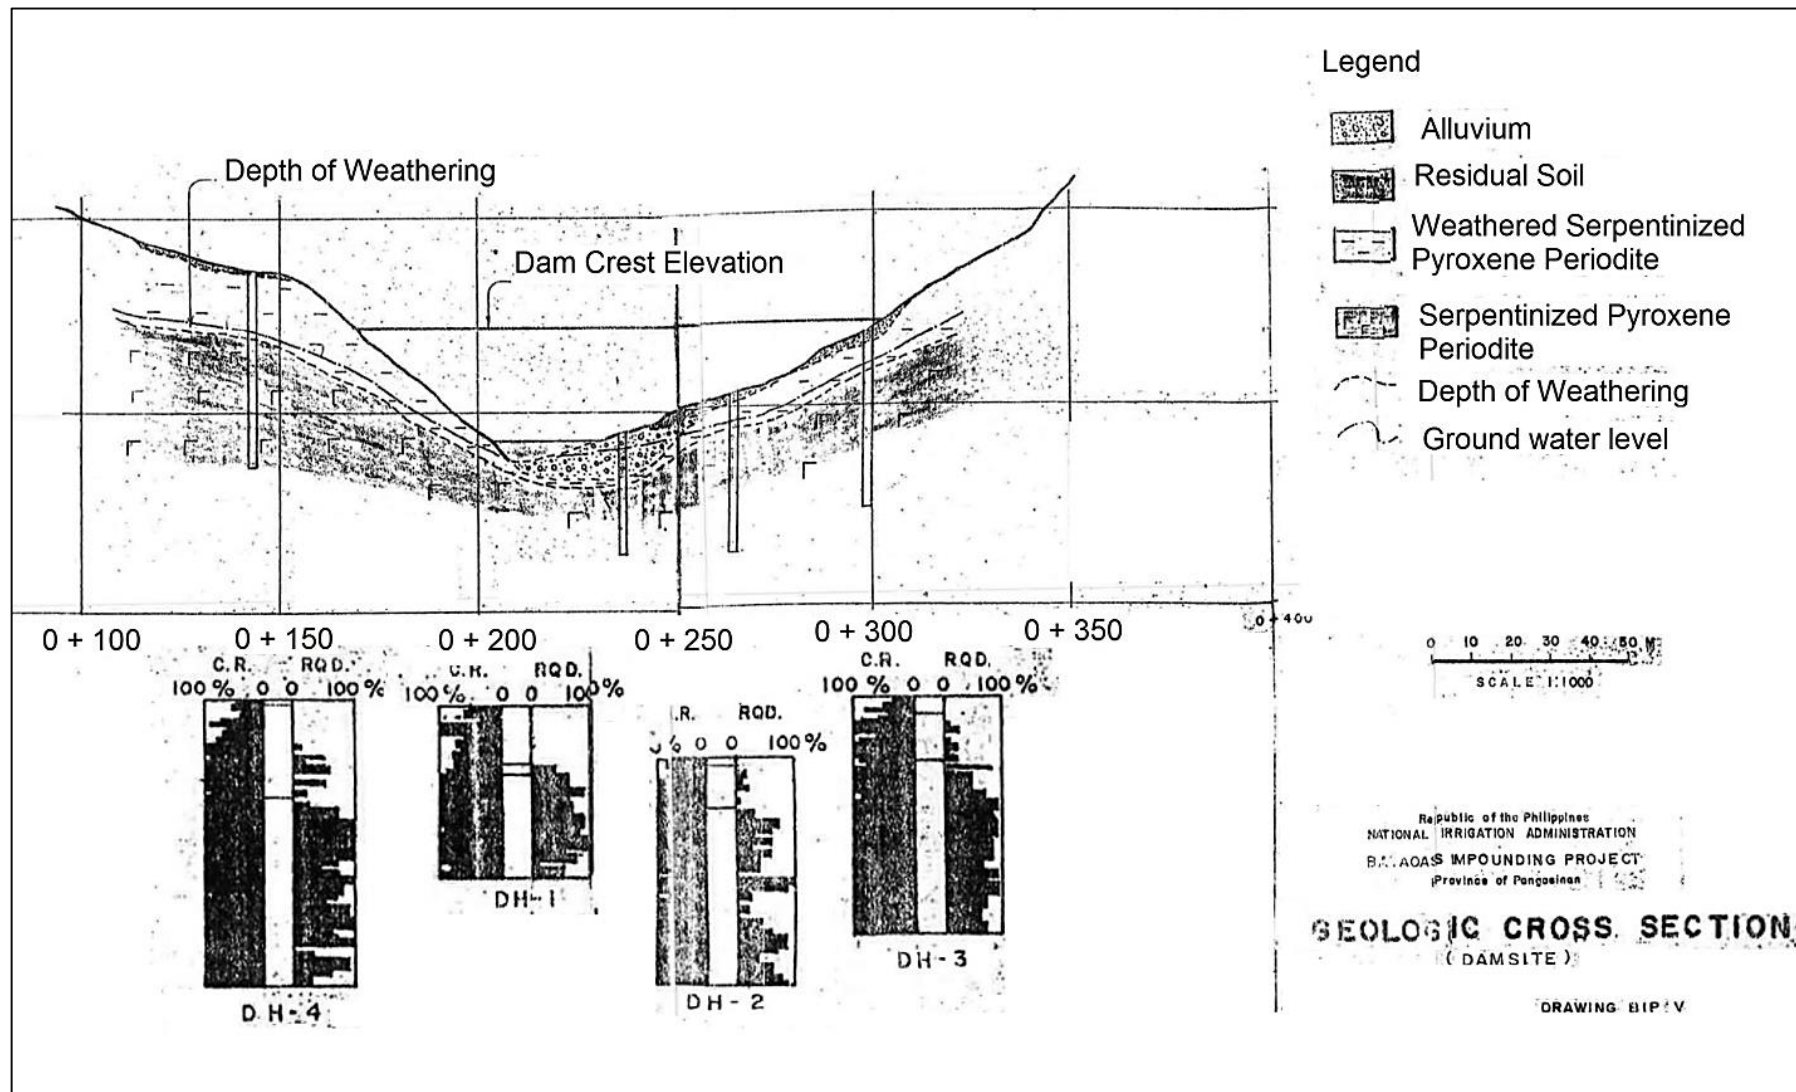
Damsite Boreholes Cross Section (looking downstream)
